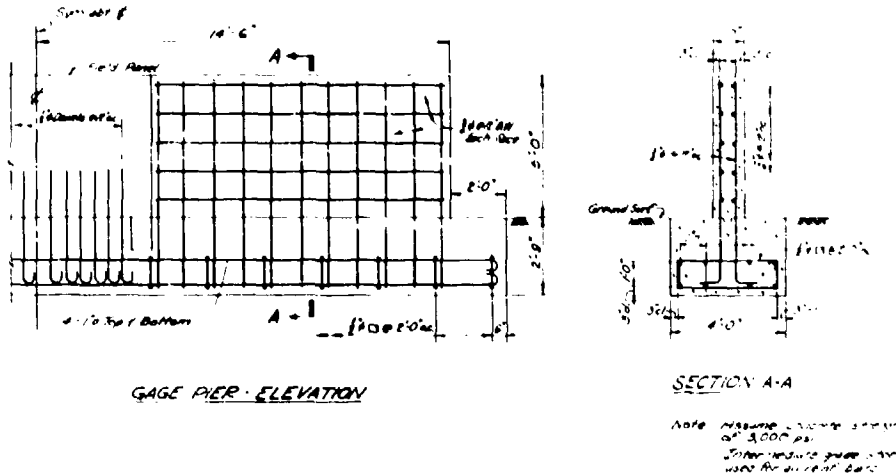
Structural details and elevation views of (Item 28) Stations 20A, B, C, D, E, and F, Site Janet.
